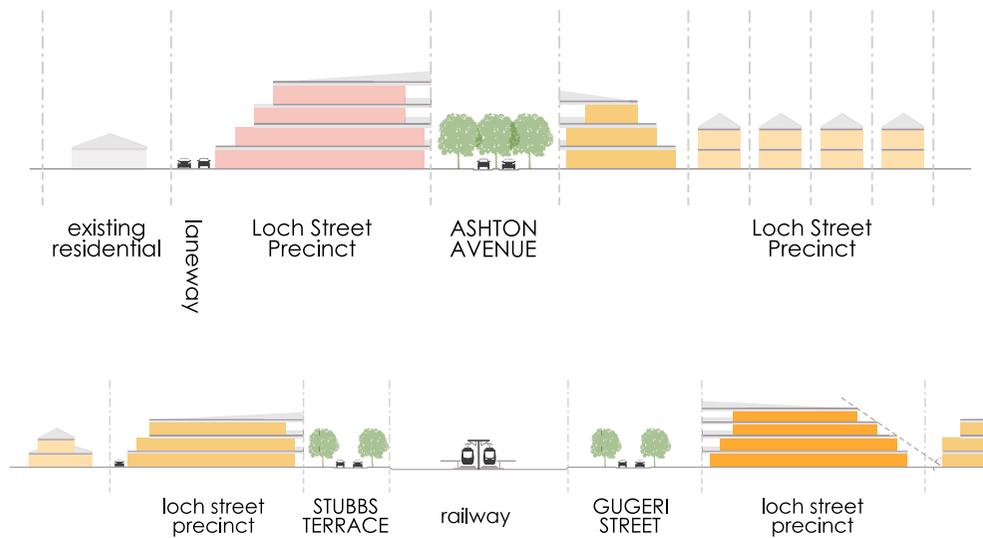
Cross Section A-A and B-B shown spatially on Figure 20, outlining the potential built form envelopes for new development within the Loch Street Station Precinct
